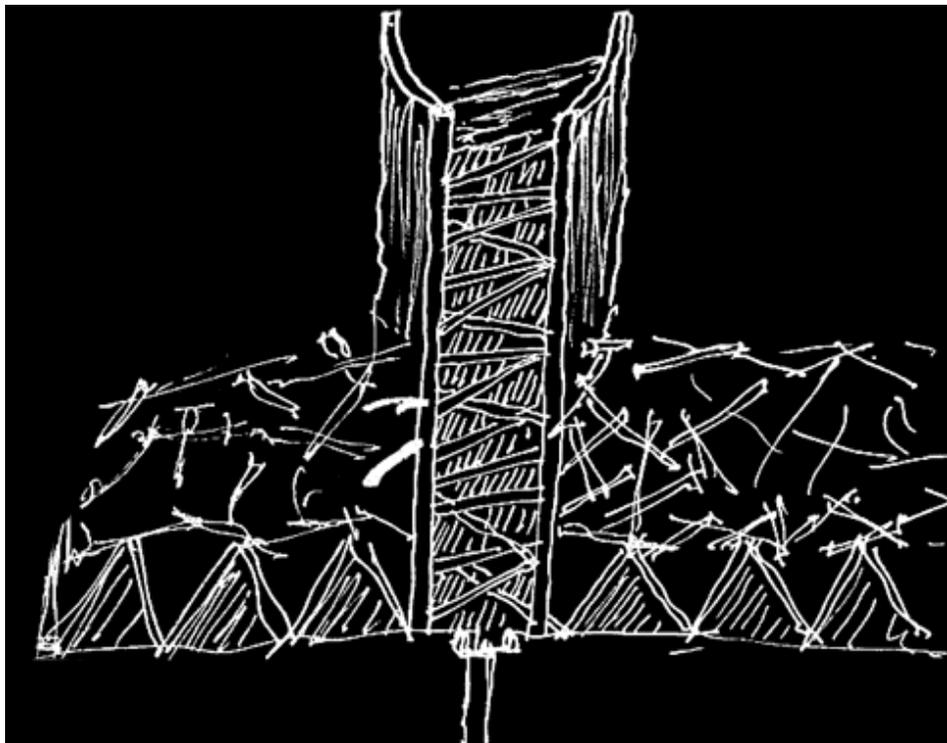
Sketch elevation with 'web' supported glazing suspended from the edges of the tower walls.
